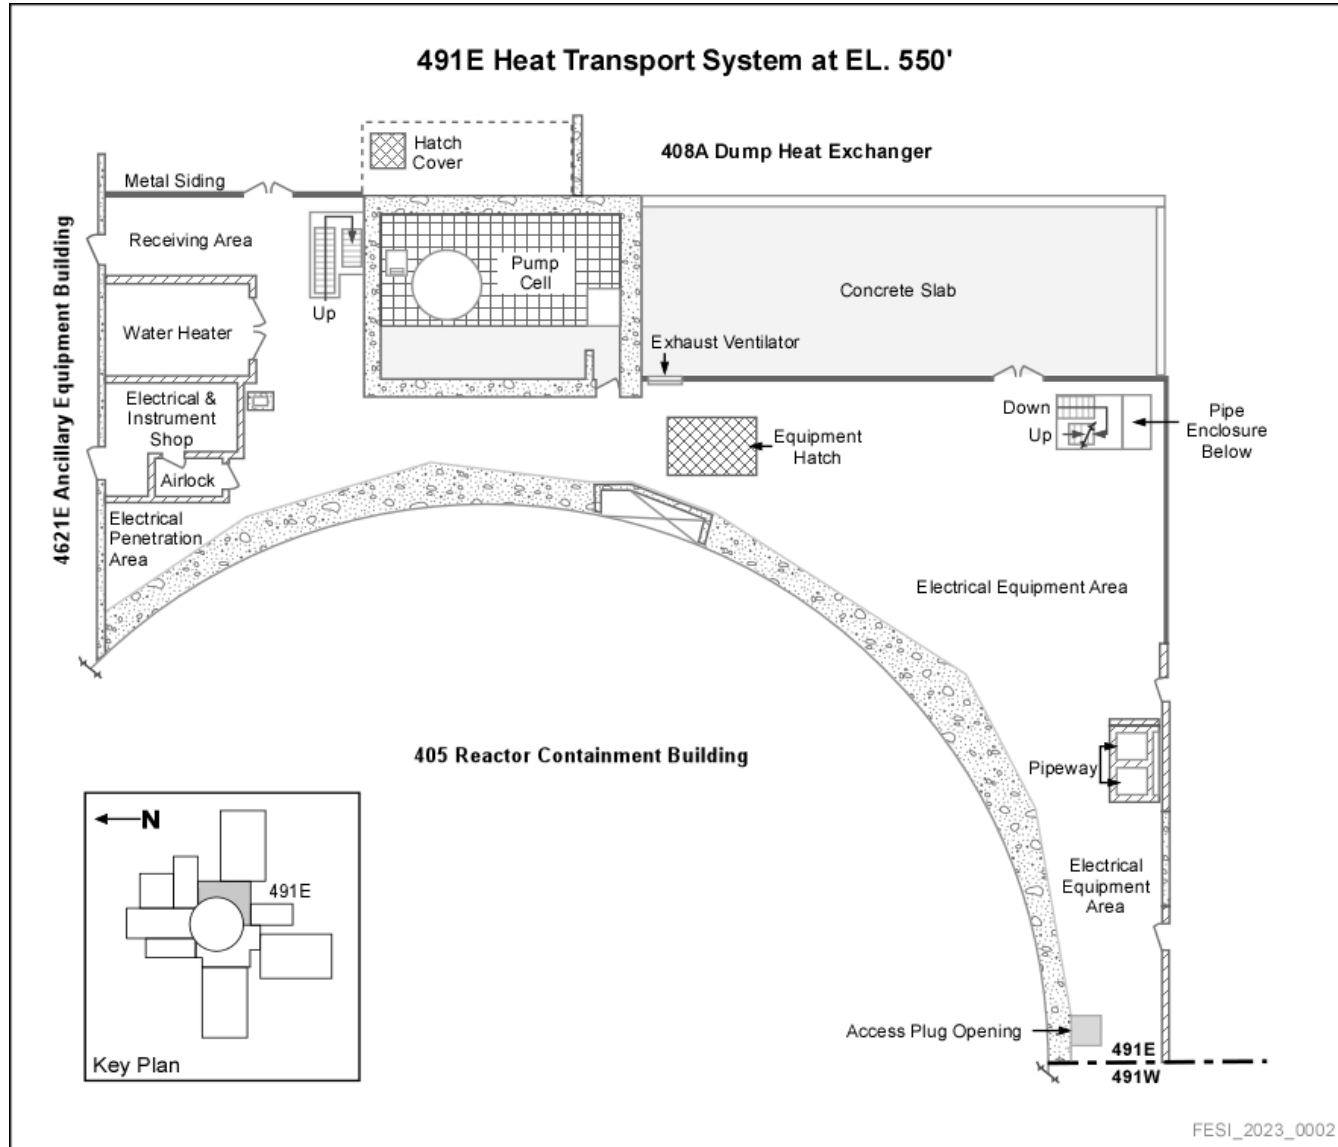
Plan View of 491E Heat Transport System Service Building (550 ft Elevation)
